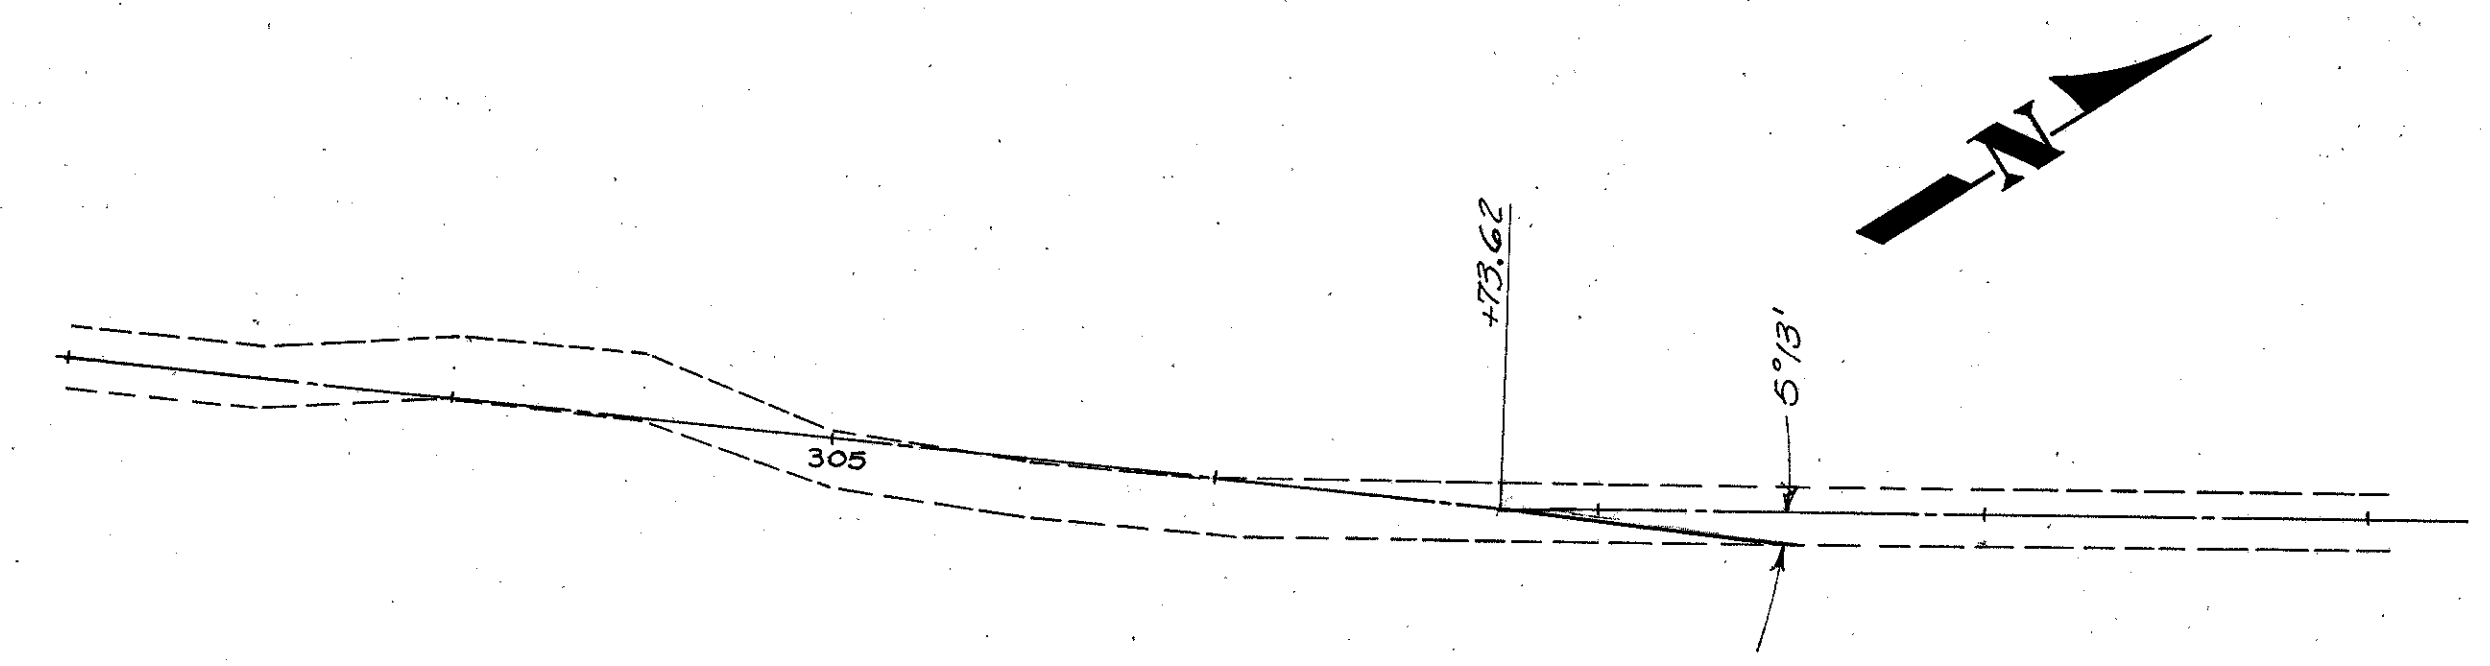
PLATE A - CROSS SECTION ON 4 R.L.T. STANDARD PROVISION PAPER CO. DRAWING
